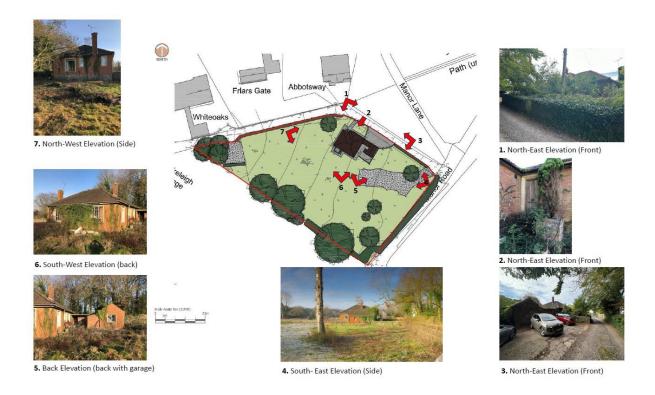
Site Plan with photographs of the principal (front) elevation and the back and side elevations of the original dwellinghouse.
